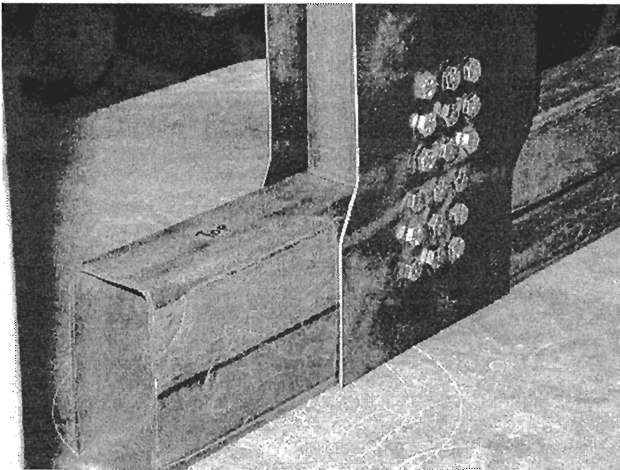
Typical Lateral Buckling of Unstiffened Plate
